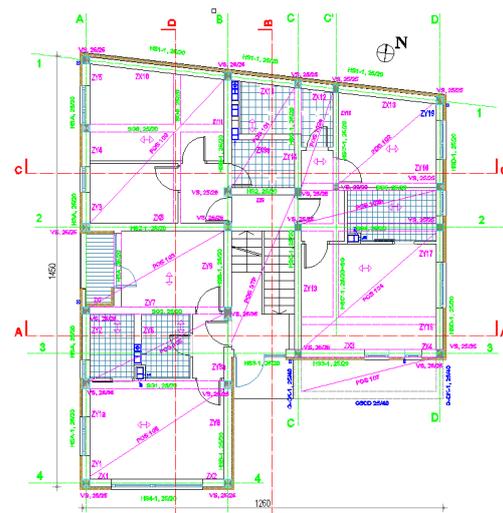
Ground-floor layout for the case study building—CM solution. (This is layout of the structural elements of the CM structure. Red color: Position of the vertical sections; Letters in green color: marked horizontal confining elements of the CM structure in X- and Y directions; construction directions: 1–1, 2–2, 3–3 . . . A–A, B–B . . . D–D; Signs and letters in magenta color: position of vertical confining elements, marked walls of the CM structure in X- and Y directions, floors (POS 103, POS 105. . .)).
